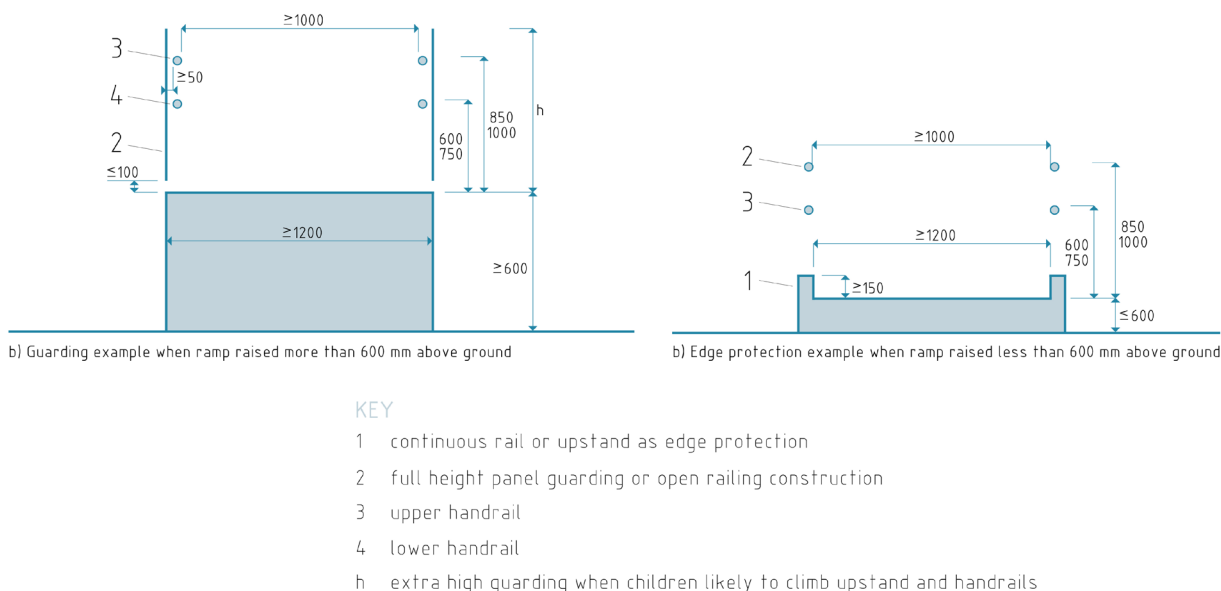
Ramps' sections (Suláková according to EN 17210:2021)
